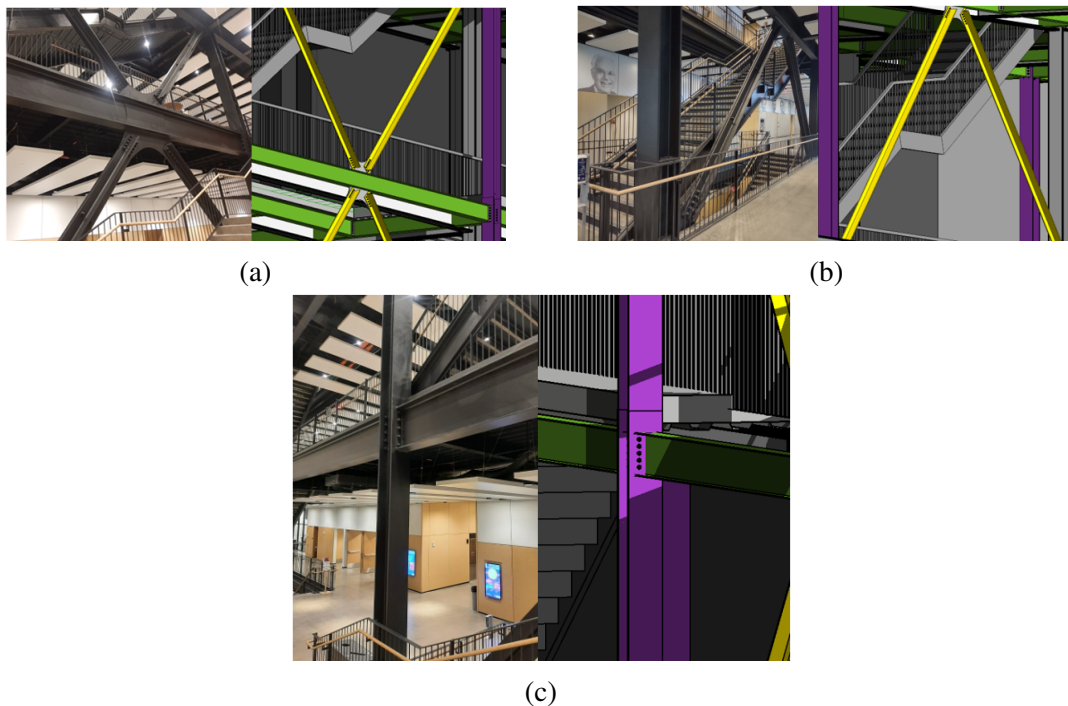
Pictures of the CIF (a) gusset plates (b) braces (c) beam-column connection
